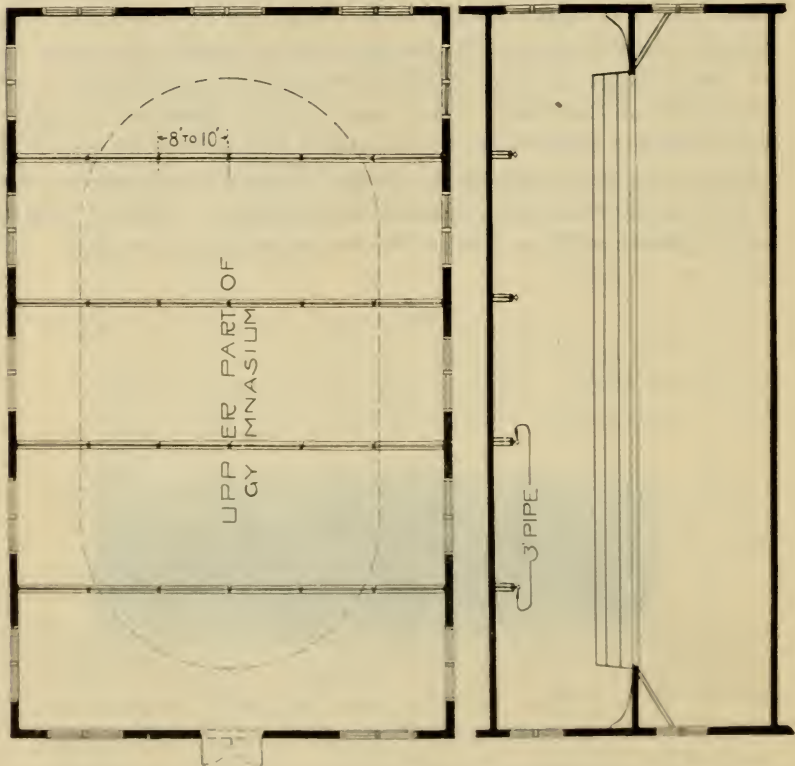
Typical Situation Pipe Beams for Attaching Suspended Apparatus. These sketches represent a building in which the ceiling beam height is correct; for incorrect beam heights, see following sketches:
